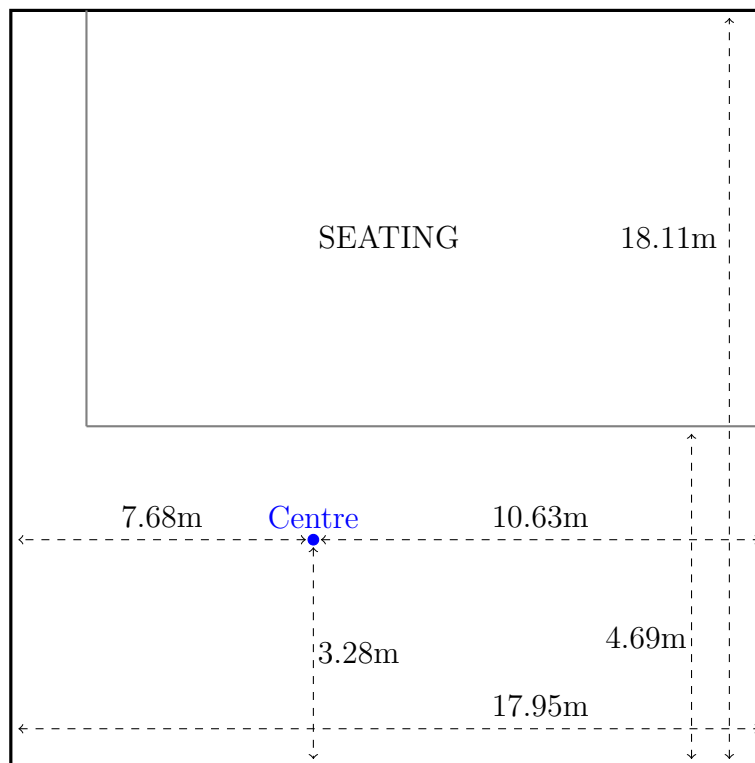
A floor plan schematic of Hendrix Hall.
